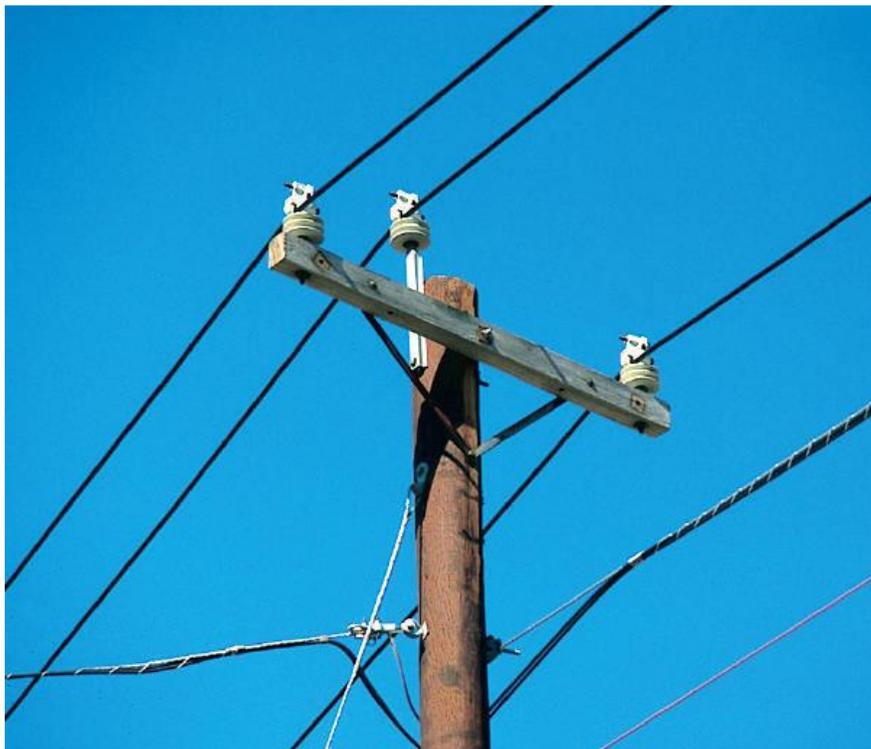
An example of crossarm-mounted CC, or "tree wire," construction. Photo from Hendrix Aerial Cable Systems [Trager].
